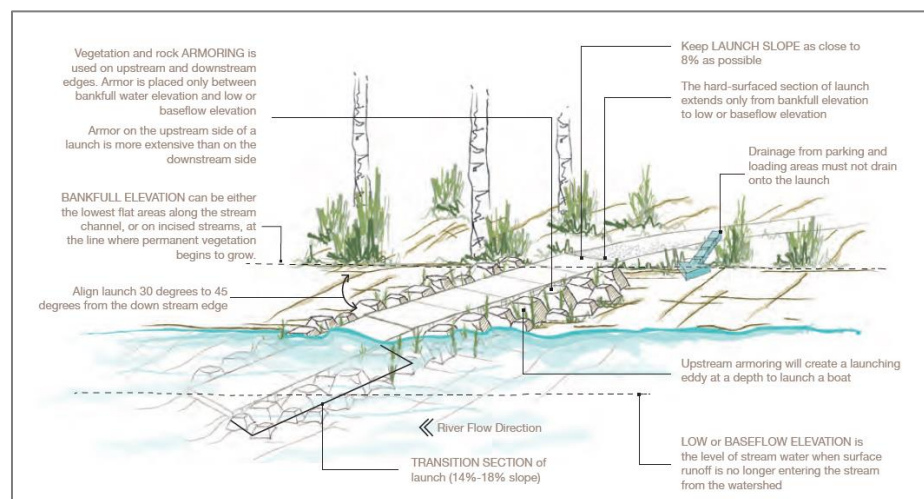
TYPICAL LAUNCH DESIGN CONCEPTS¹⁸
